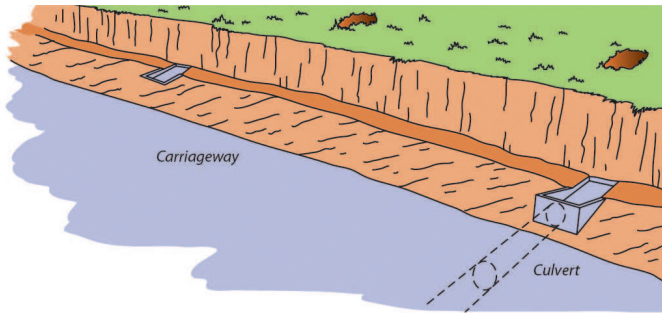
Side drains collect surface water from the road and embankments to be discharged at suitable locations or through culverts (ILO, 1990).
